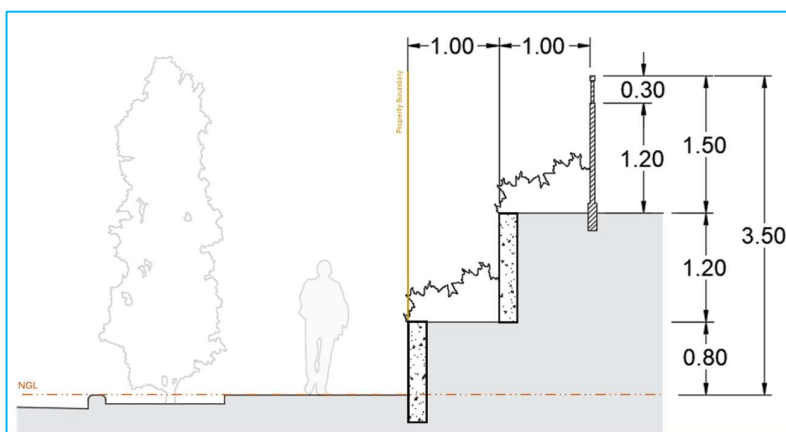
(dii) Retaining wall and fence height - two steps
